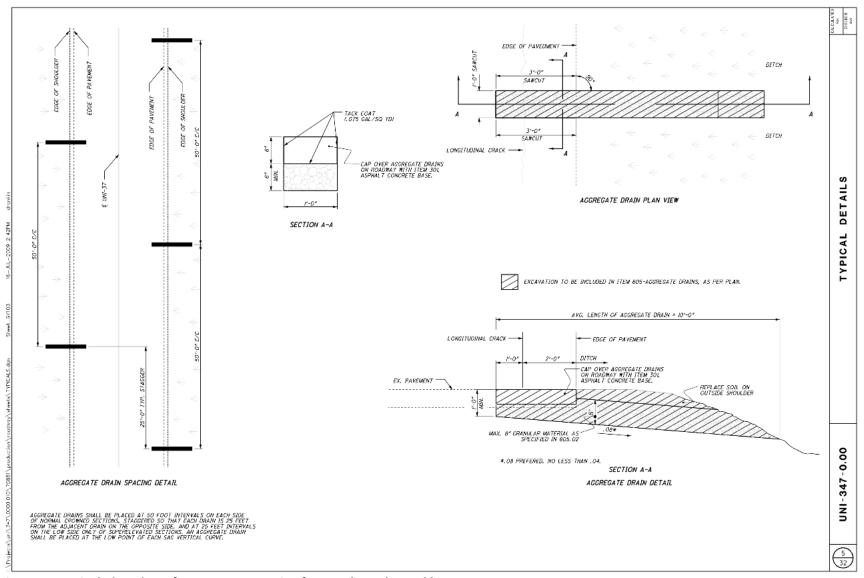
Typical Plan Sheet for Aggregate Drains for Rural Roads used by ODOT.
